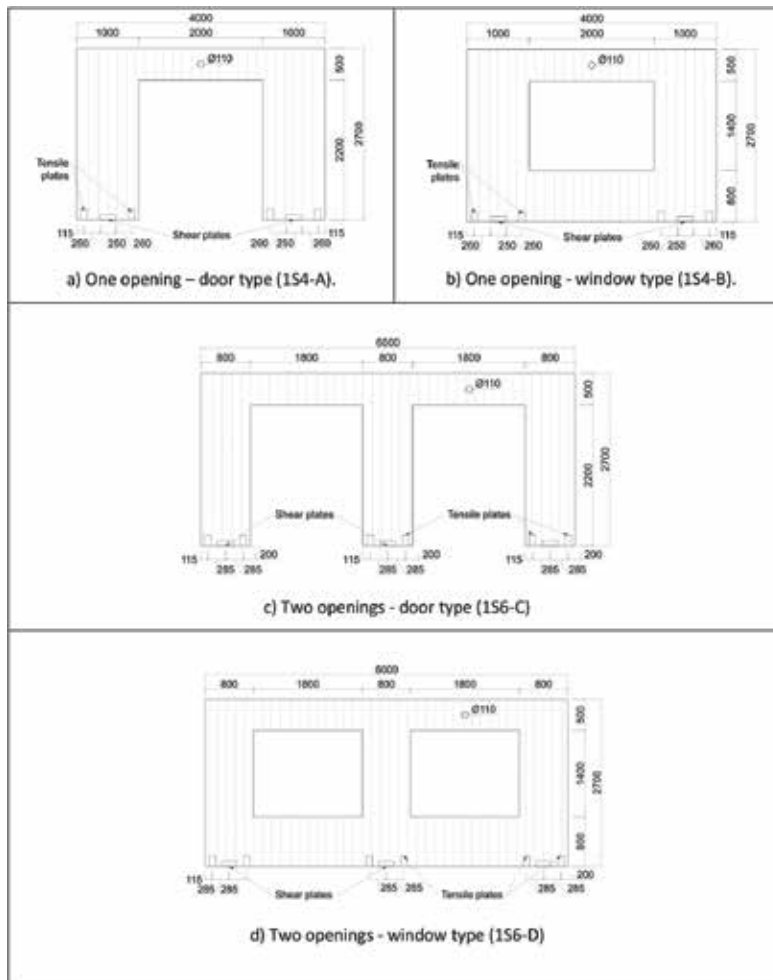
Configuration and dimensions in mm of the tested CLT panels. (a) One opening—door type (1S4-A). (b) One opening—window type (1S4-B). (c) Two openings—door type (1S6-C). (d) Two openings—window type (1S6-D).
